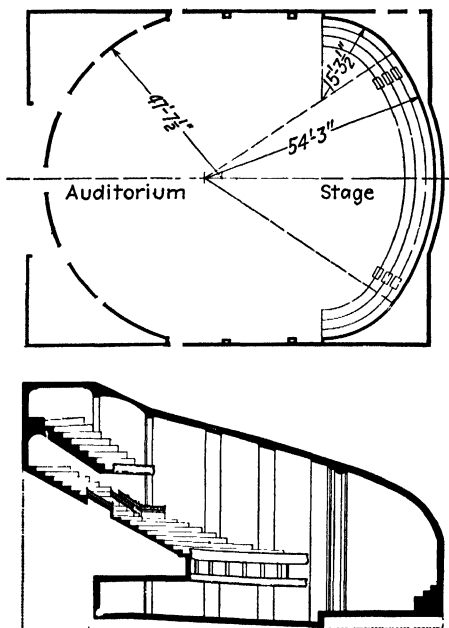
Plan and section, Orchestra Hall, Chicago.
